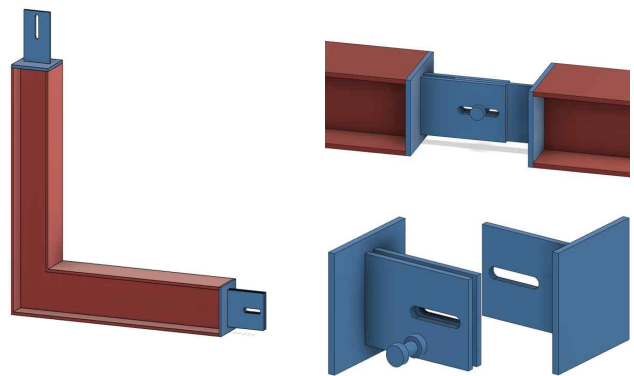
Hinge detail of the proposed steel frame retrofit system
